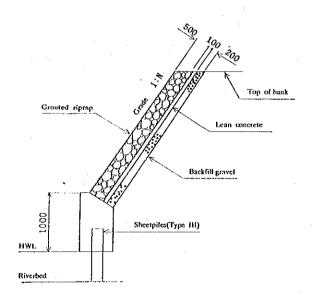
STEEL SHEETPILE FOUNDATION GROUTED RIPRAP
